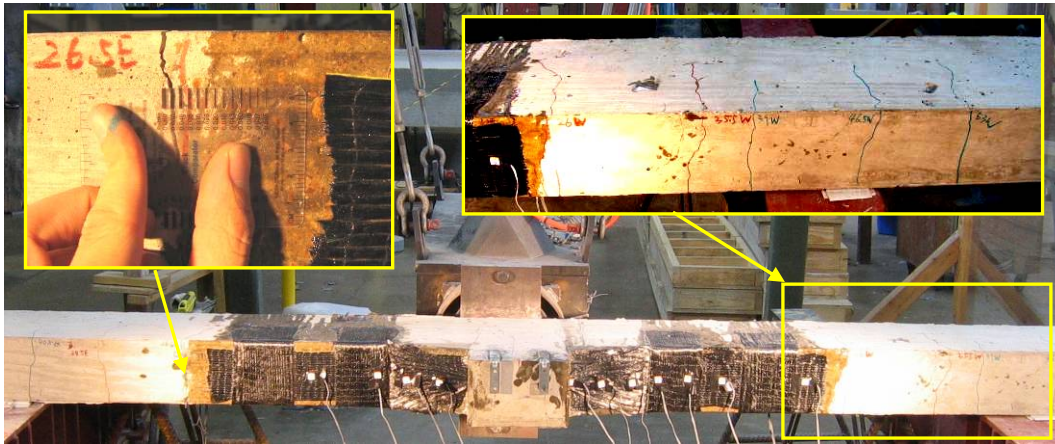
Failure of C-BC-U-6G, 3 in. (yield of steel reinforcement)
